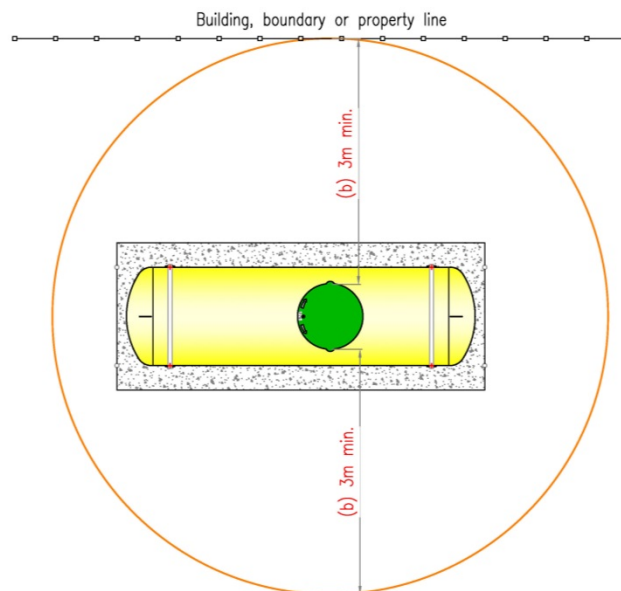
Below ground tank siting arrangement without gas dispersion wall
